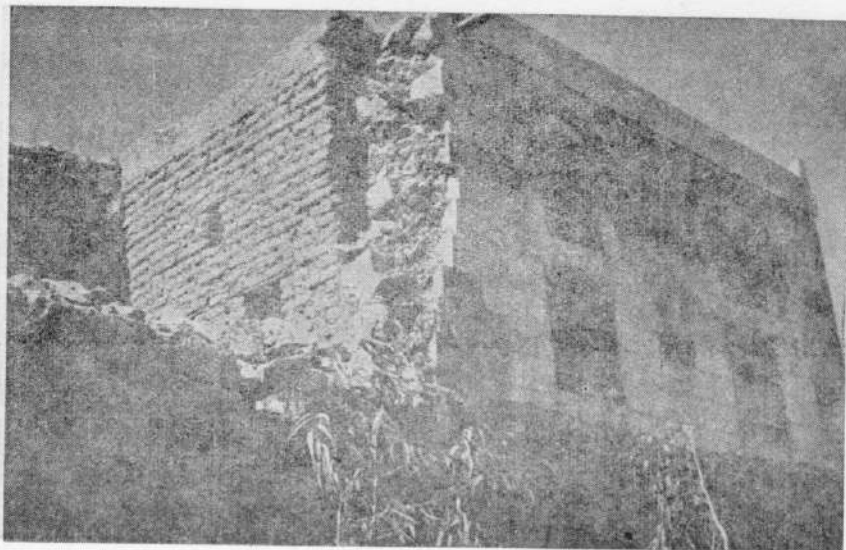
One face dressed coursed stone and another face random stone in front wall and adobe construction along side wall of a house, no interlocking at corner of wall and damage at corner in Village Warakah.
